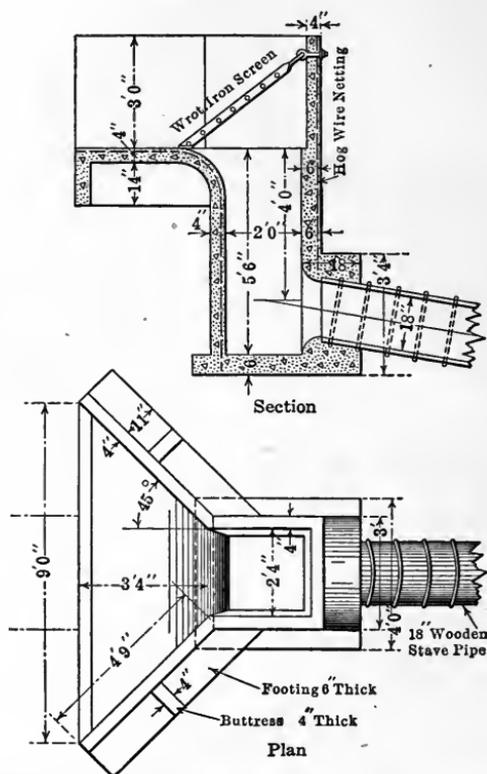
Inlet structure of Wolf Creek Siphon. American Beet Sugar Co., Colo.
